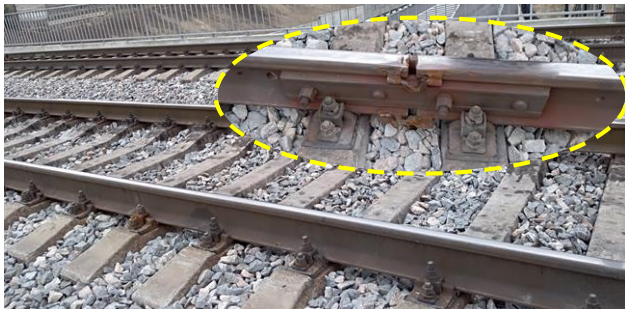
Two-track railroad over a tunnel overpass made of metal corrugated structures
